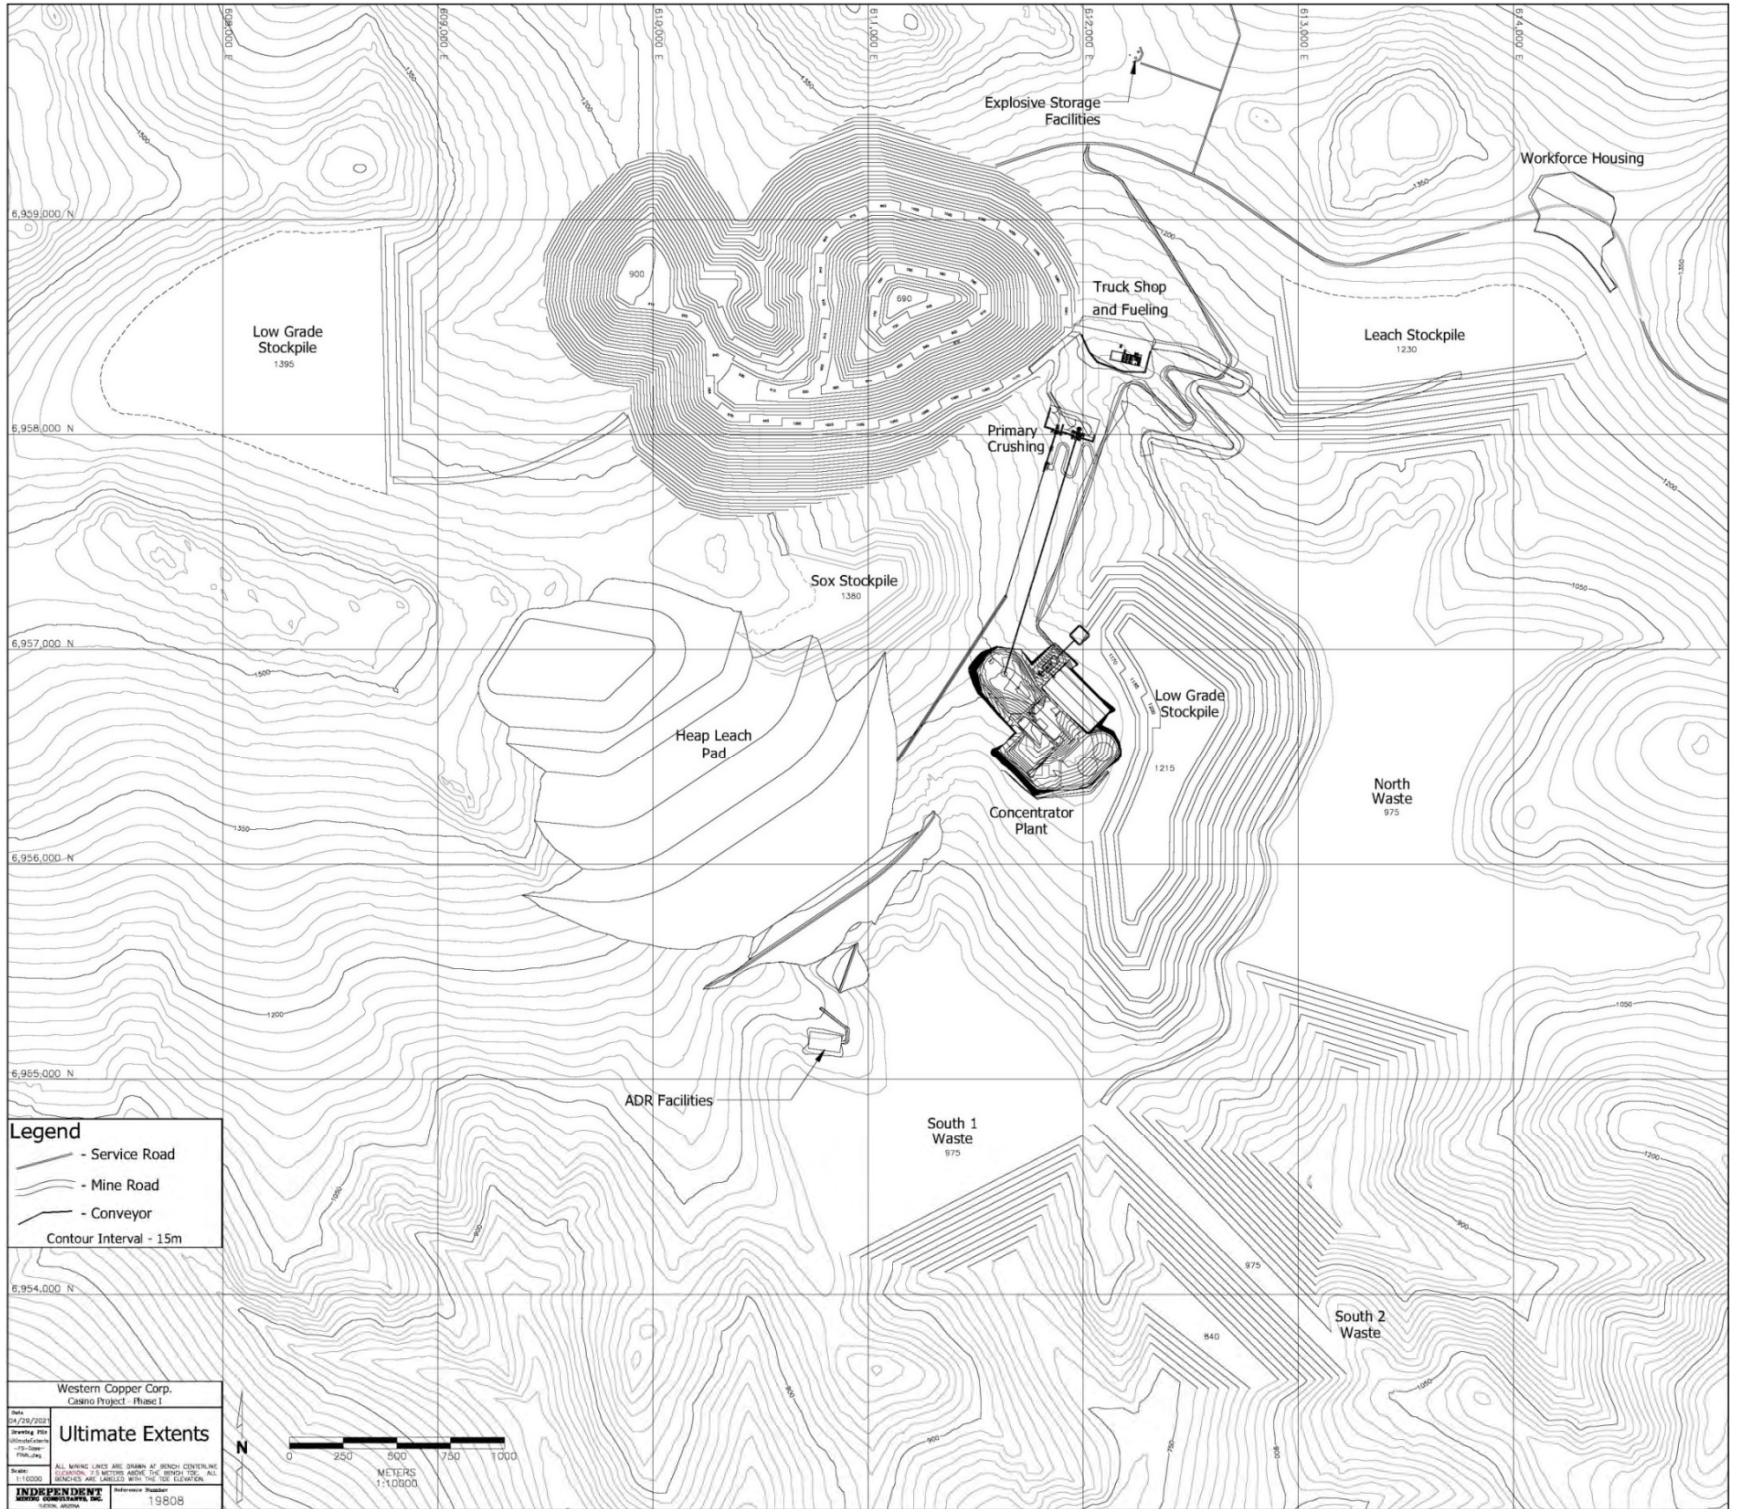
Maximum Extent of Waste Storage Areas and Stockpiles (IMC, 2021)
